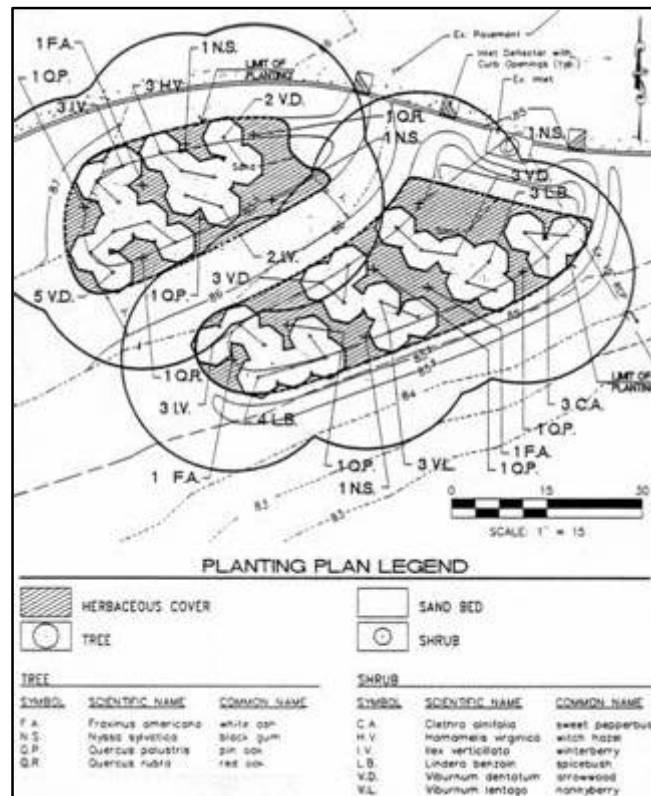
Portion of Typical Landscaping Plan for Bioretention
